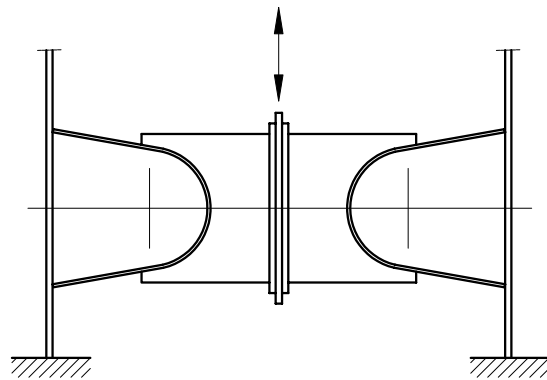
Test specimen for floating deck stiffener to crossbeam connection
